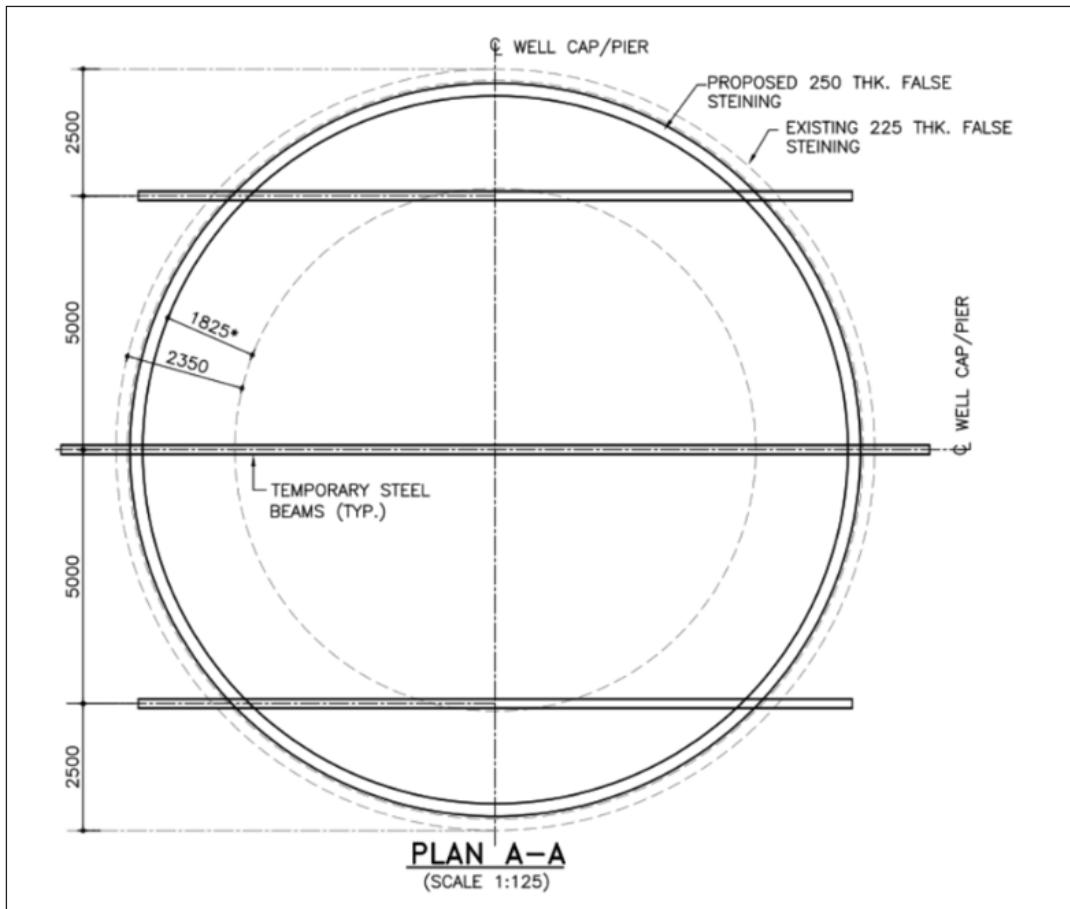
Temporary supporting arrangement for the distressed false steining
